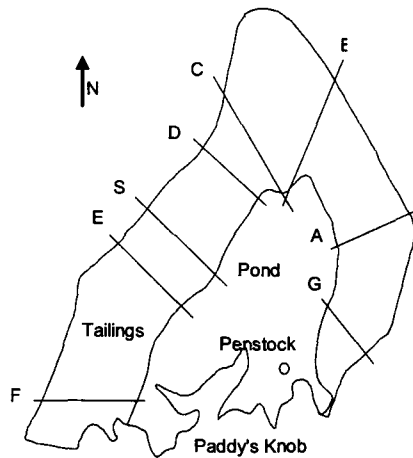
Simplified plan view of the Kidston tailing dam, showing the penstock location after 1991, and the piezometer section lines.
